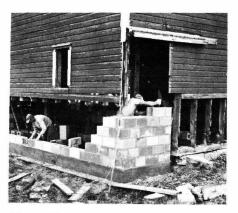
Rotten sills and the lower end of the studs are being replaced. Note that the new foundation is being built in sections. This is safer and easier than replacing an old foundation all in one operation.
